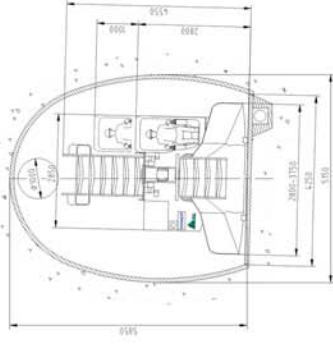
ITC 420 in Mechanical Excavation. Cross-Section 26.5 m²
